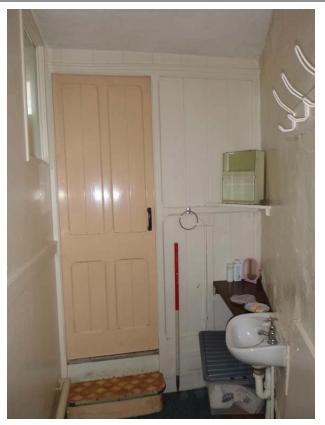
The wall dividing the two rooms of the toilet making up the west side of Room G26, viewed from the north
